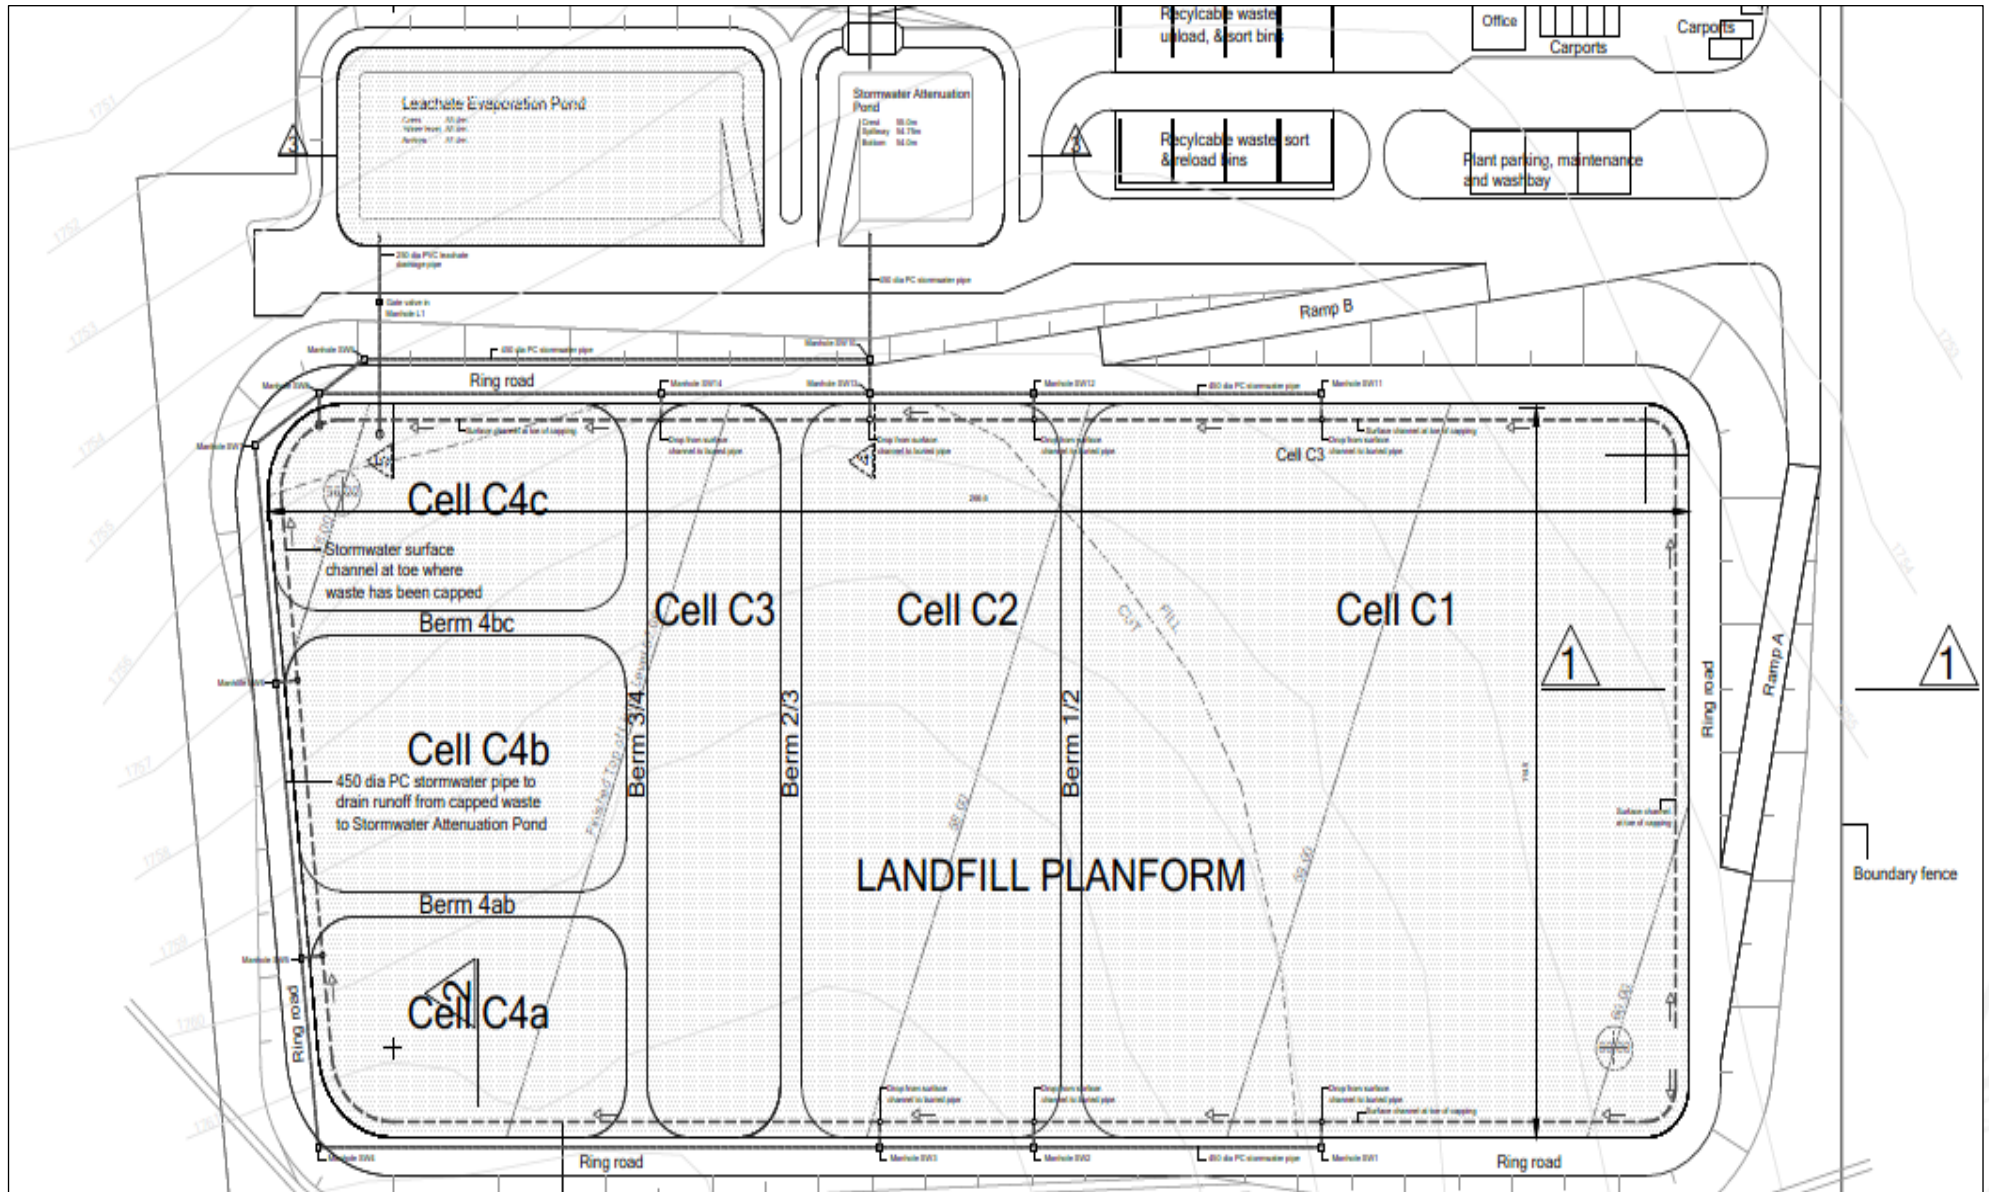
Preliminary general layout for the proposed new general waste disposal site
